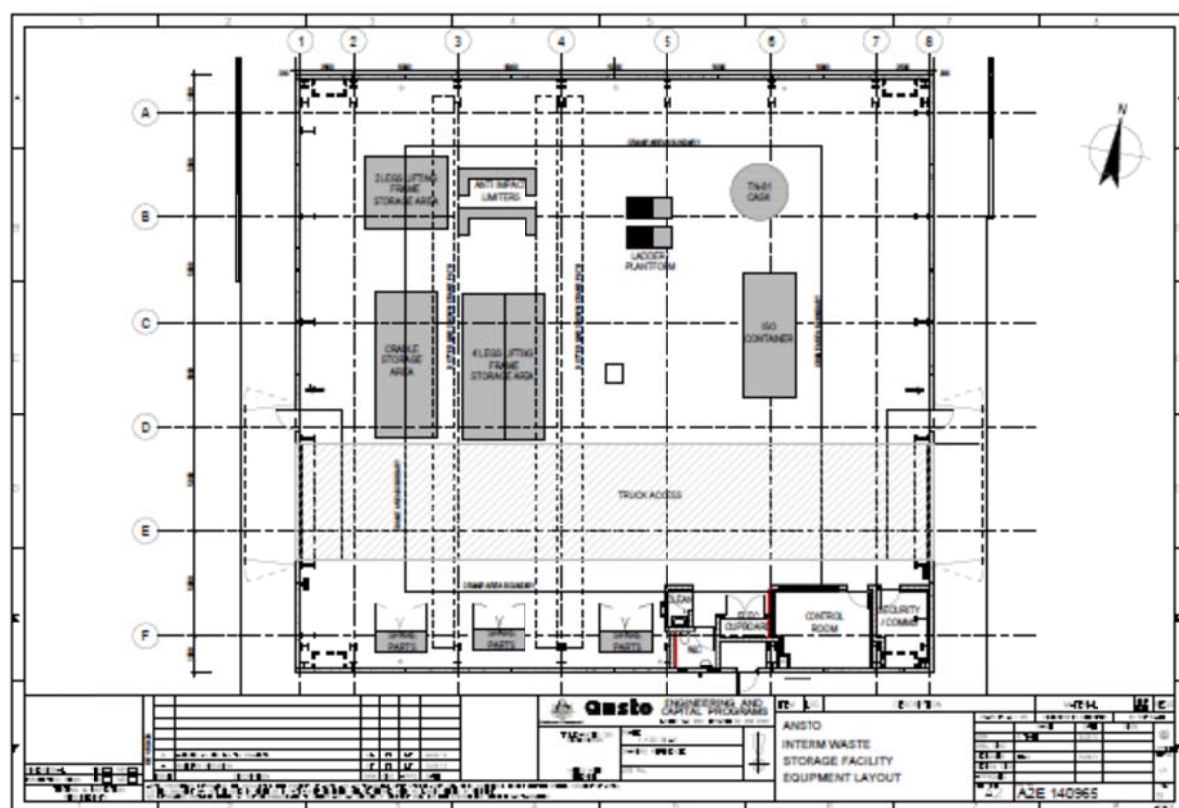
Layout Plan of the IWS Facility (from Dwg A2E 140965).
